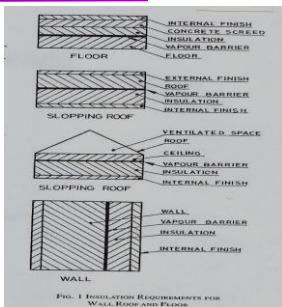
INSULATION REQUIREMENTS FOR WALL, ROOF AND FLOOR
